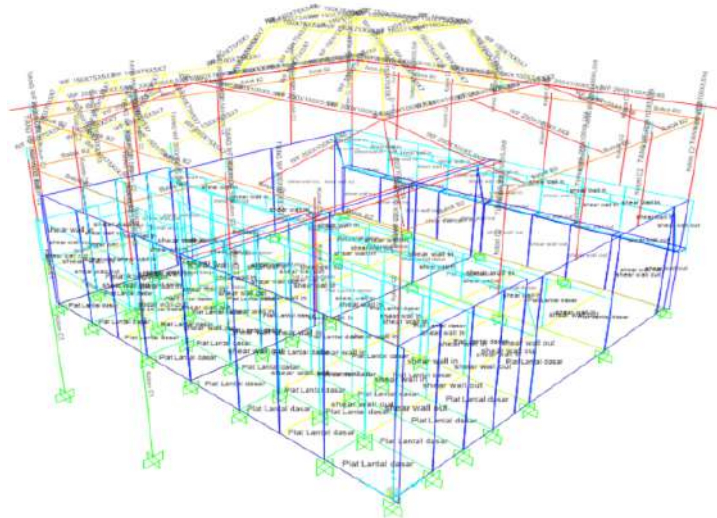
Building Structure Modelling of the WTP Building in SAP2000.
